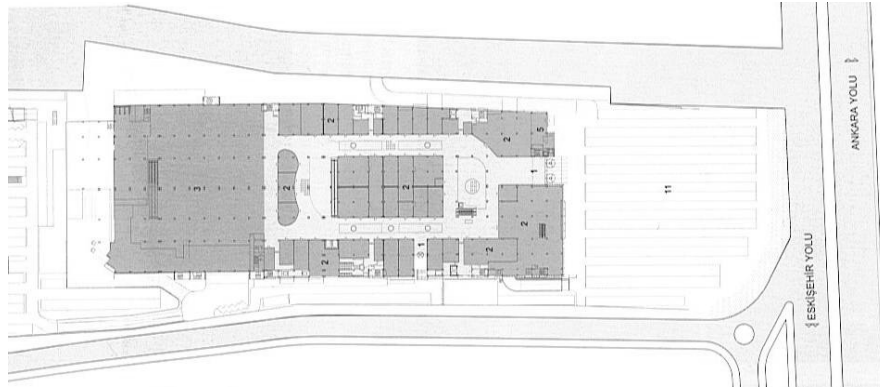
Entrance Floor Plan of the Cepa Shopping Mall (Source: Yapi, 314, 2008, pg. 69.)
